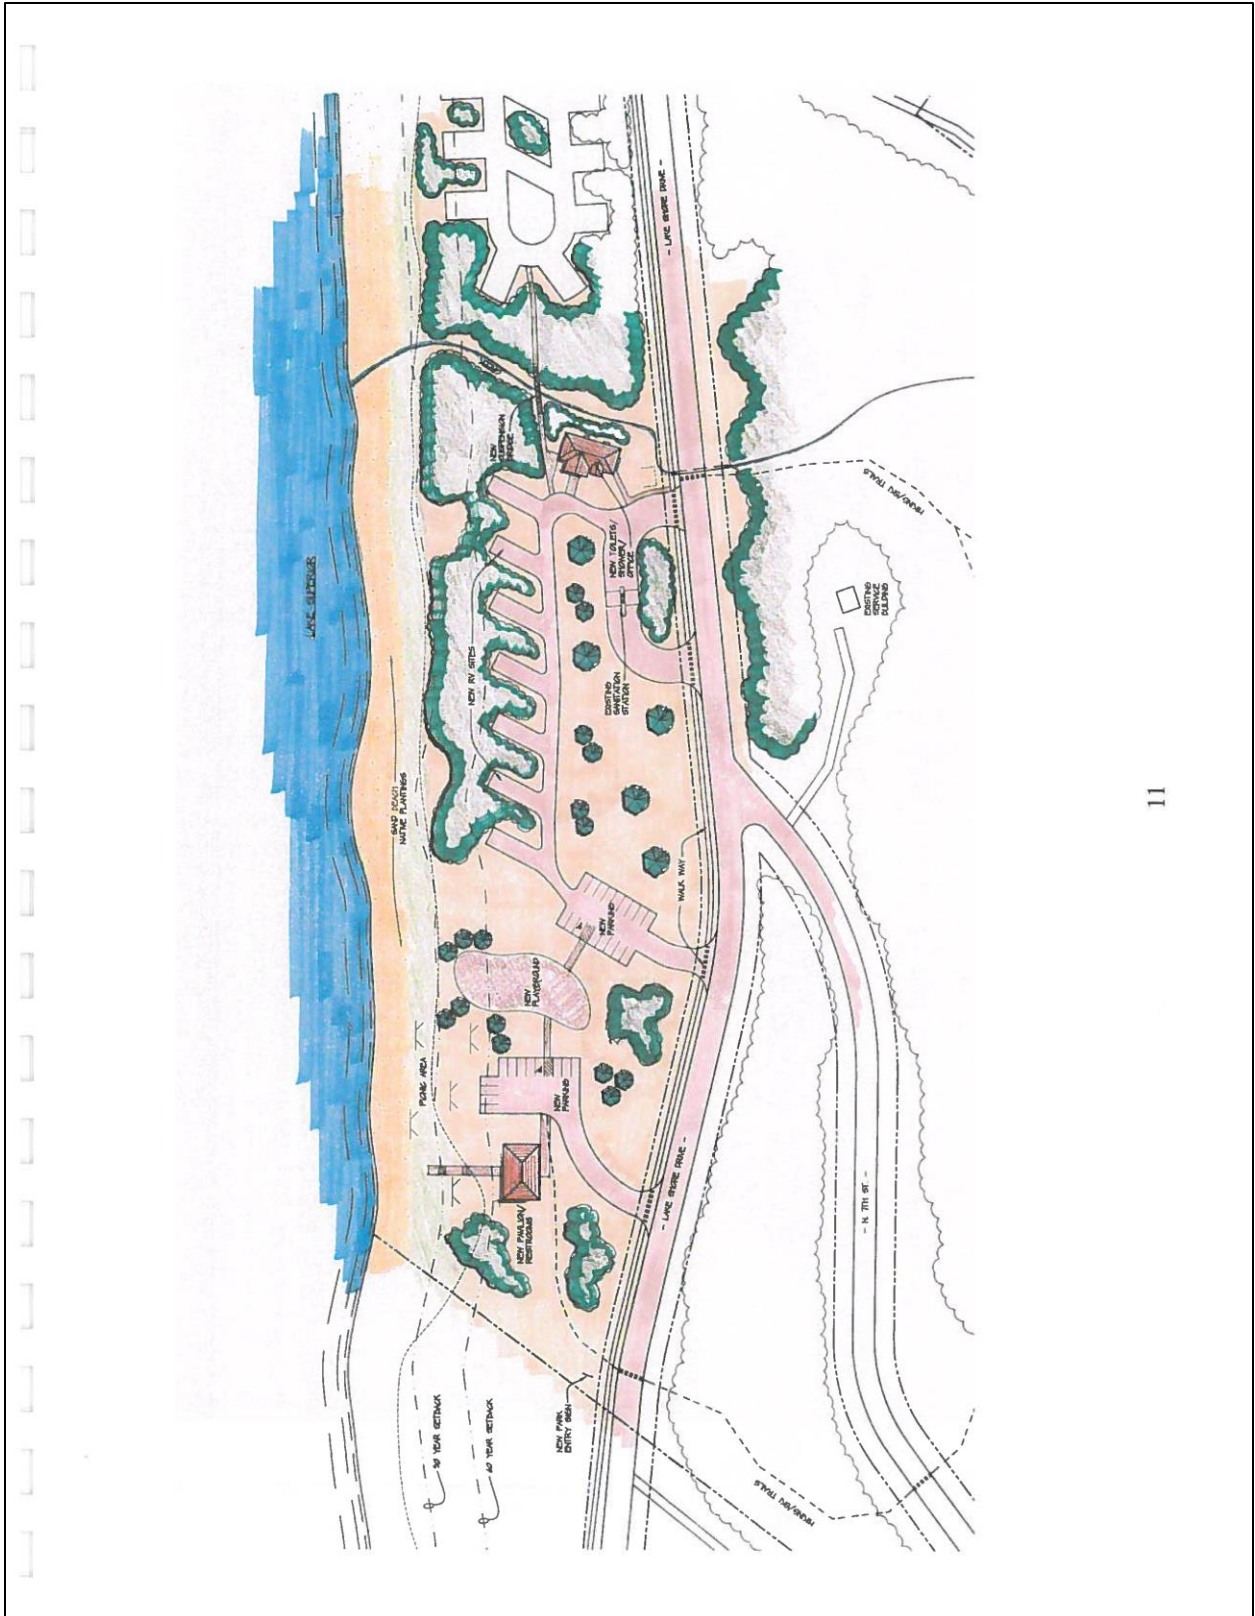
2005 Ontonagon Township Park Site Plan Map
